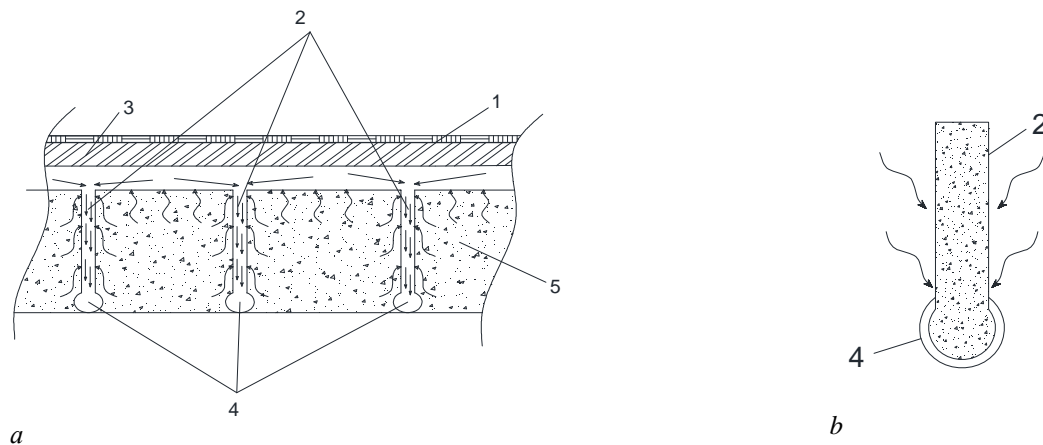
Drainage from drains from lime concrete foundry waste: *a* – general view; *b* – Section of drains;
